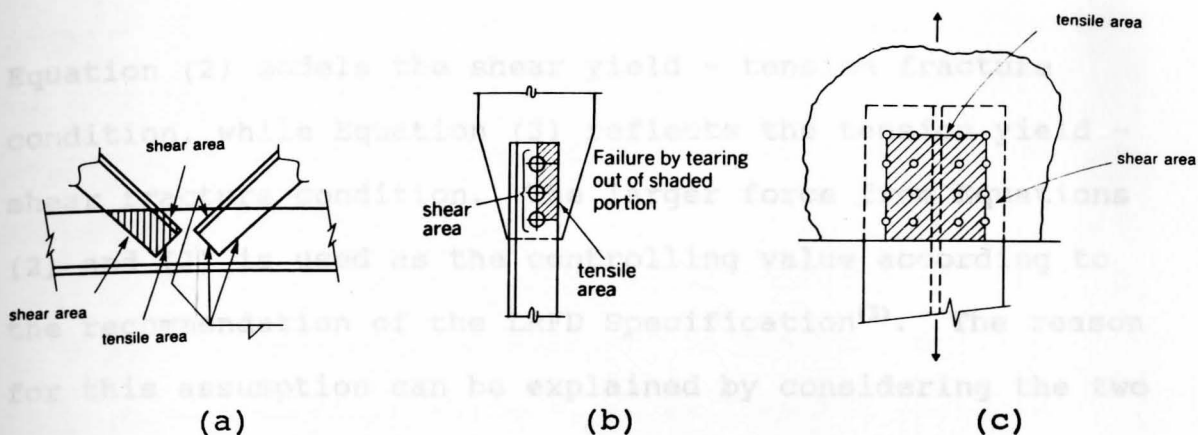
(a) Welded connections, (b) Bolted angles, (c) Bolted plates. (From Ref. 2)
